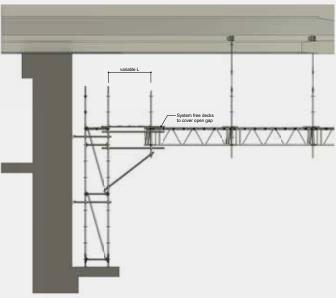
Plan view and section views of a typical solution to adopt a suspended scaffold platform with the abutment / object end.
